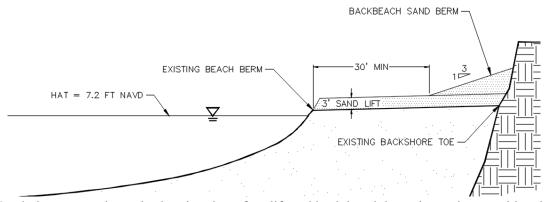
Sand placement schematic showing three-foot lift and back beach berm located to provide minimum 30 feet seaward to existing beach berm.
